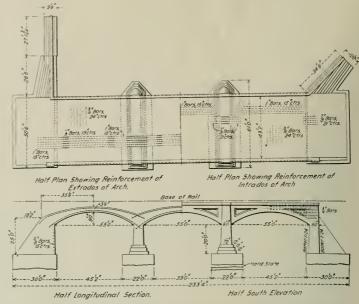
Plan and Elevation of Eagle Creek Bridge.
